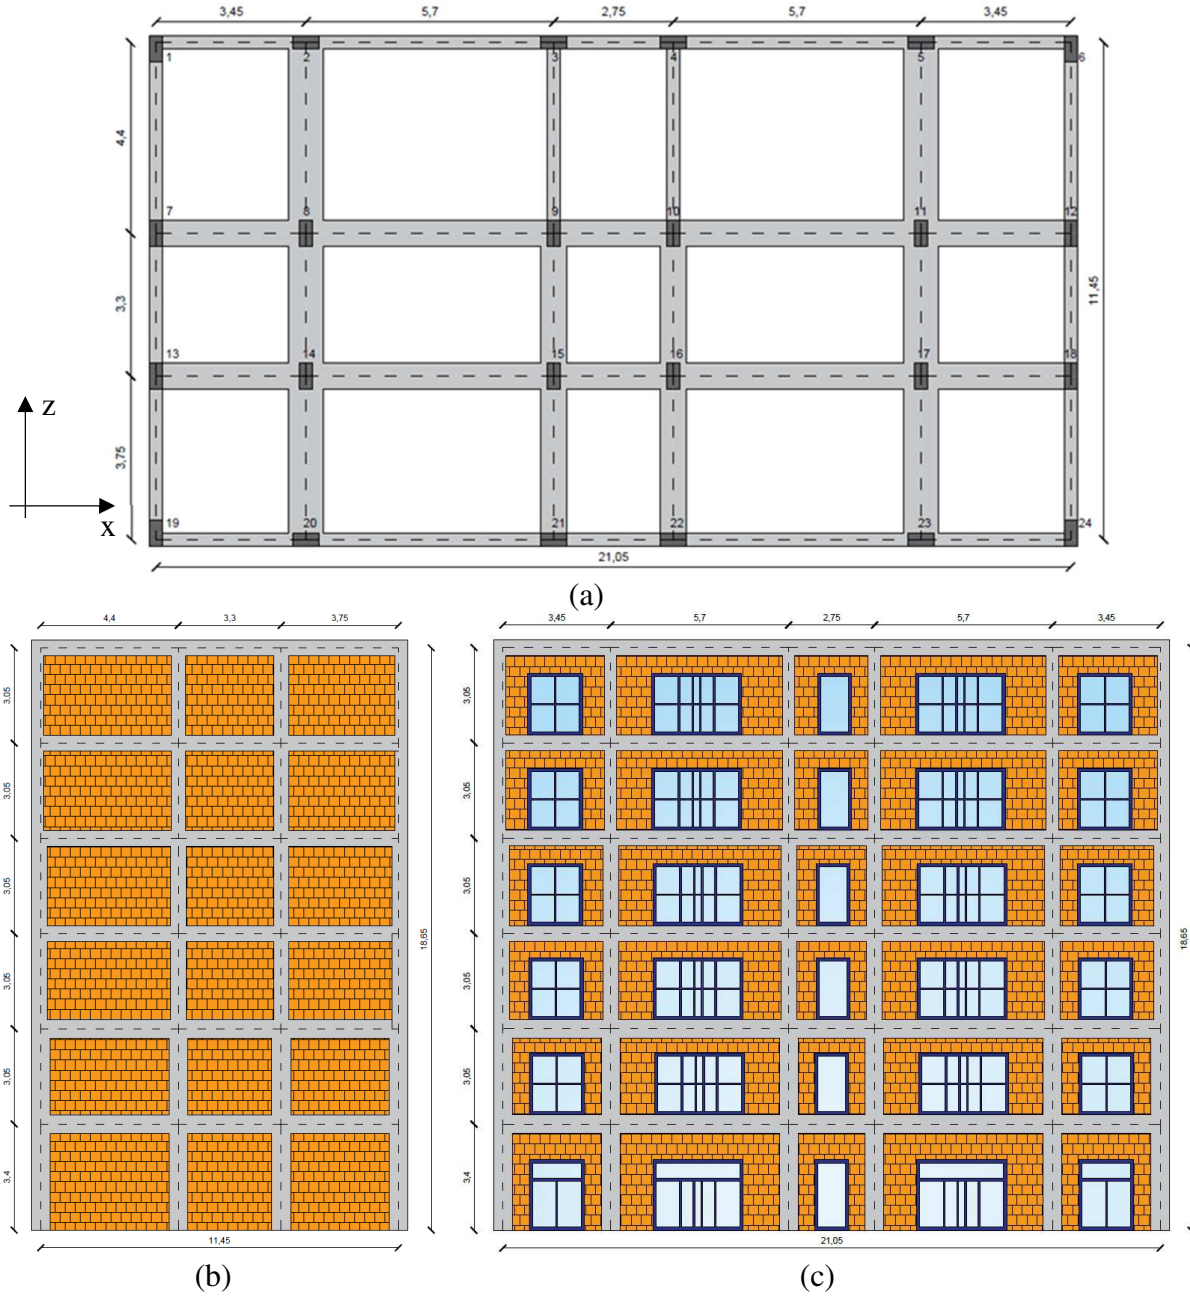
Case Study: (a) typological floor plan; (b) short side elevation; (c) long side elevation
